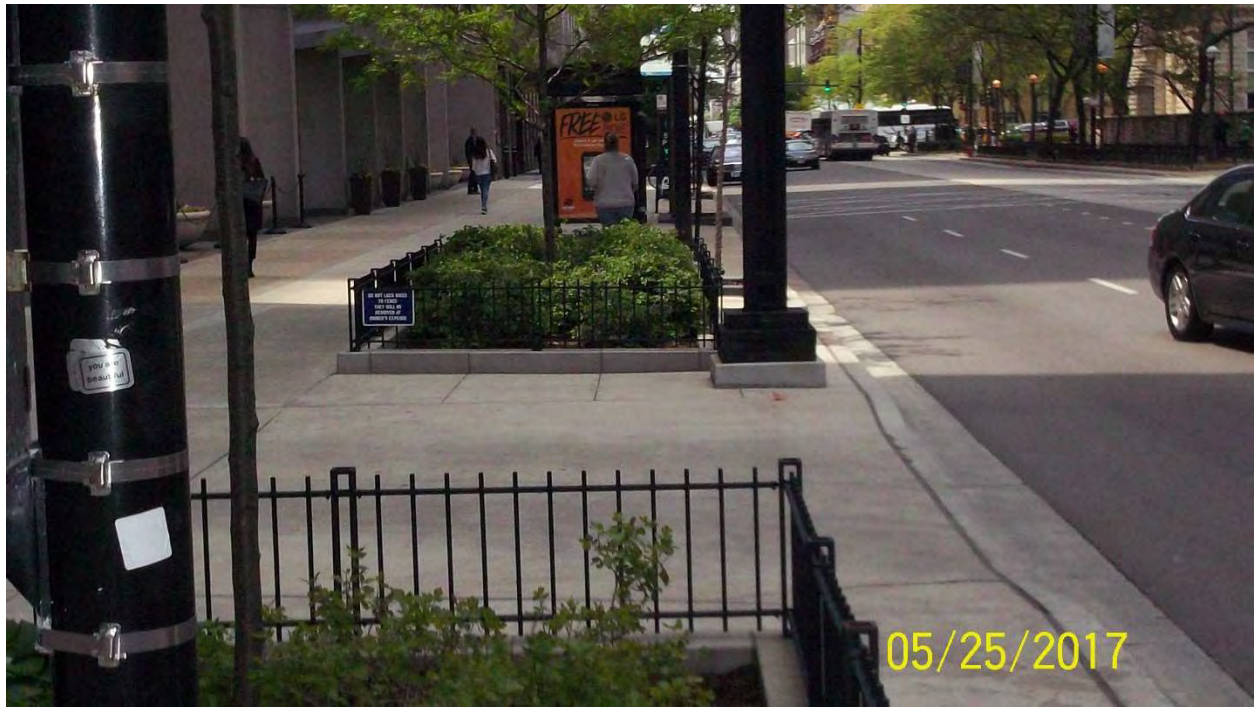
Southwest corner of Chicago Ave. / Mies van der Rohe – Looking West
